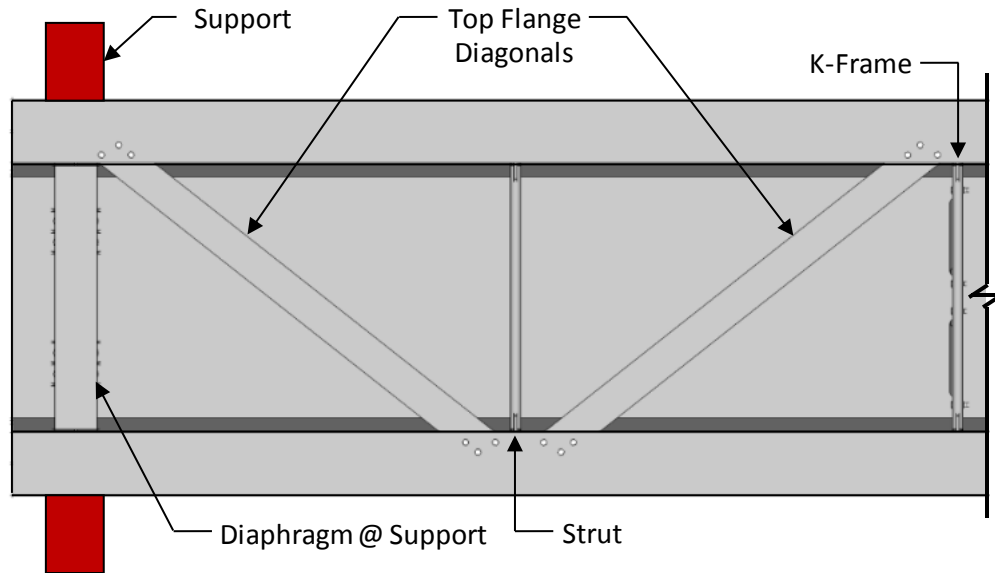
Tub Girder Deformation near the Supports – Plan View
